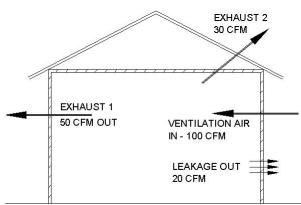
, Building Air Balance Mechanical Ventilation and Exhaust
